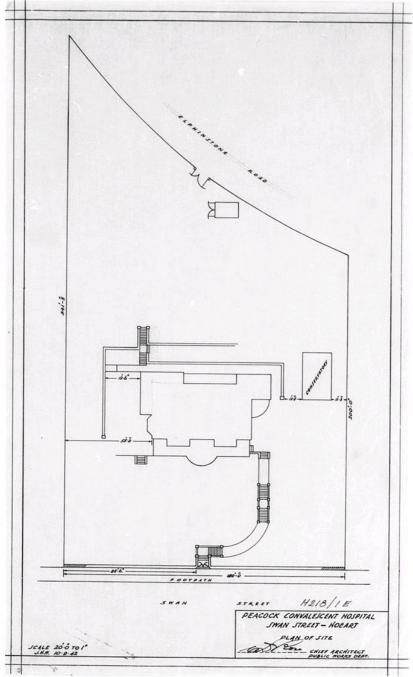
Site plan of Ruardean 1942. Tasmanian Archive and Heritage Office PWD266.4.4371
